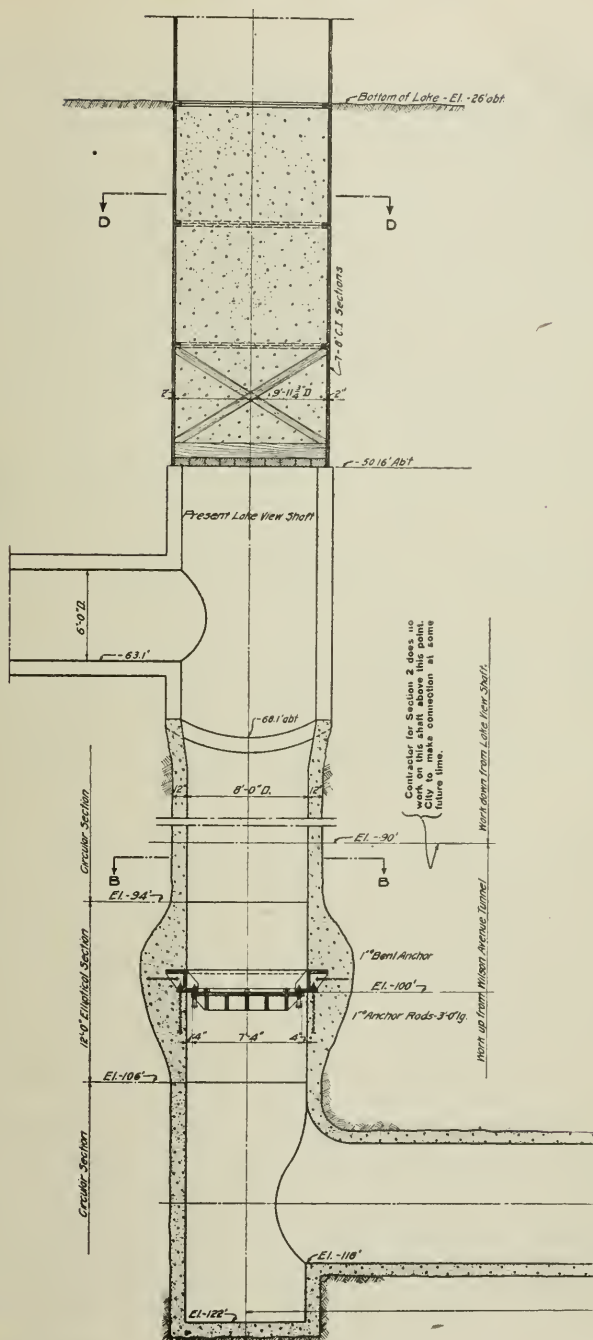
Shaft at Connection Between Wilson Avenue Tunnel and Lake View Crib.
